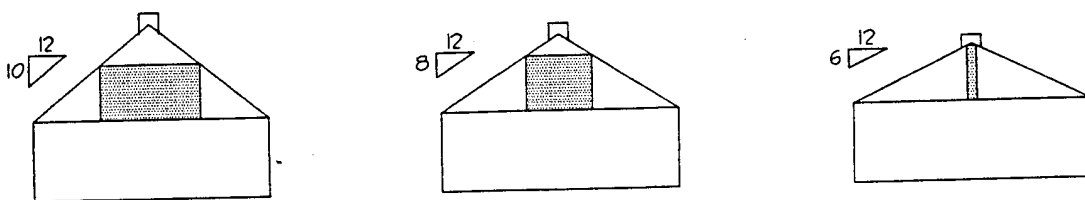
Effect of Lower Roof Pitch on Useable Area of Attic
